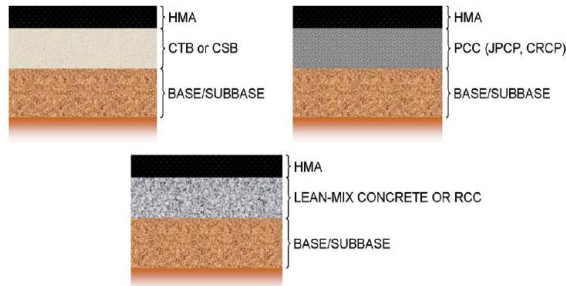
Typical Cross-Sections of Composite Pavements
